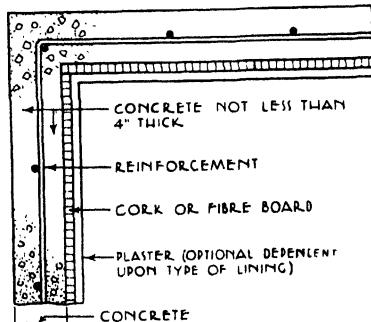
R.C. CONCRETE WALL WITH LINING OF CORK, FIBRE, OR OTHER INSULATING BOARD LINING
